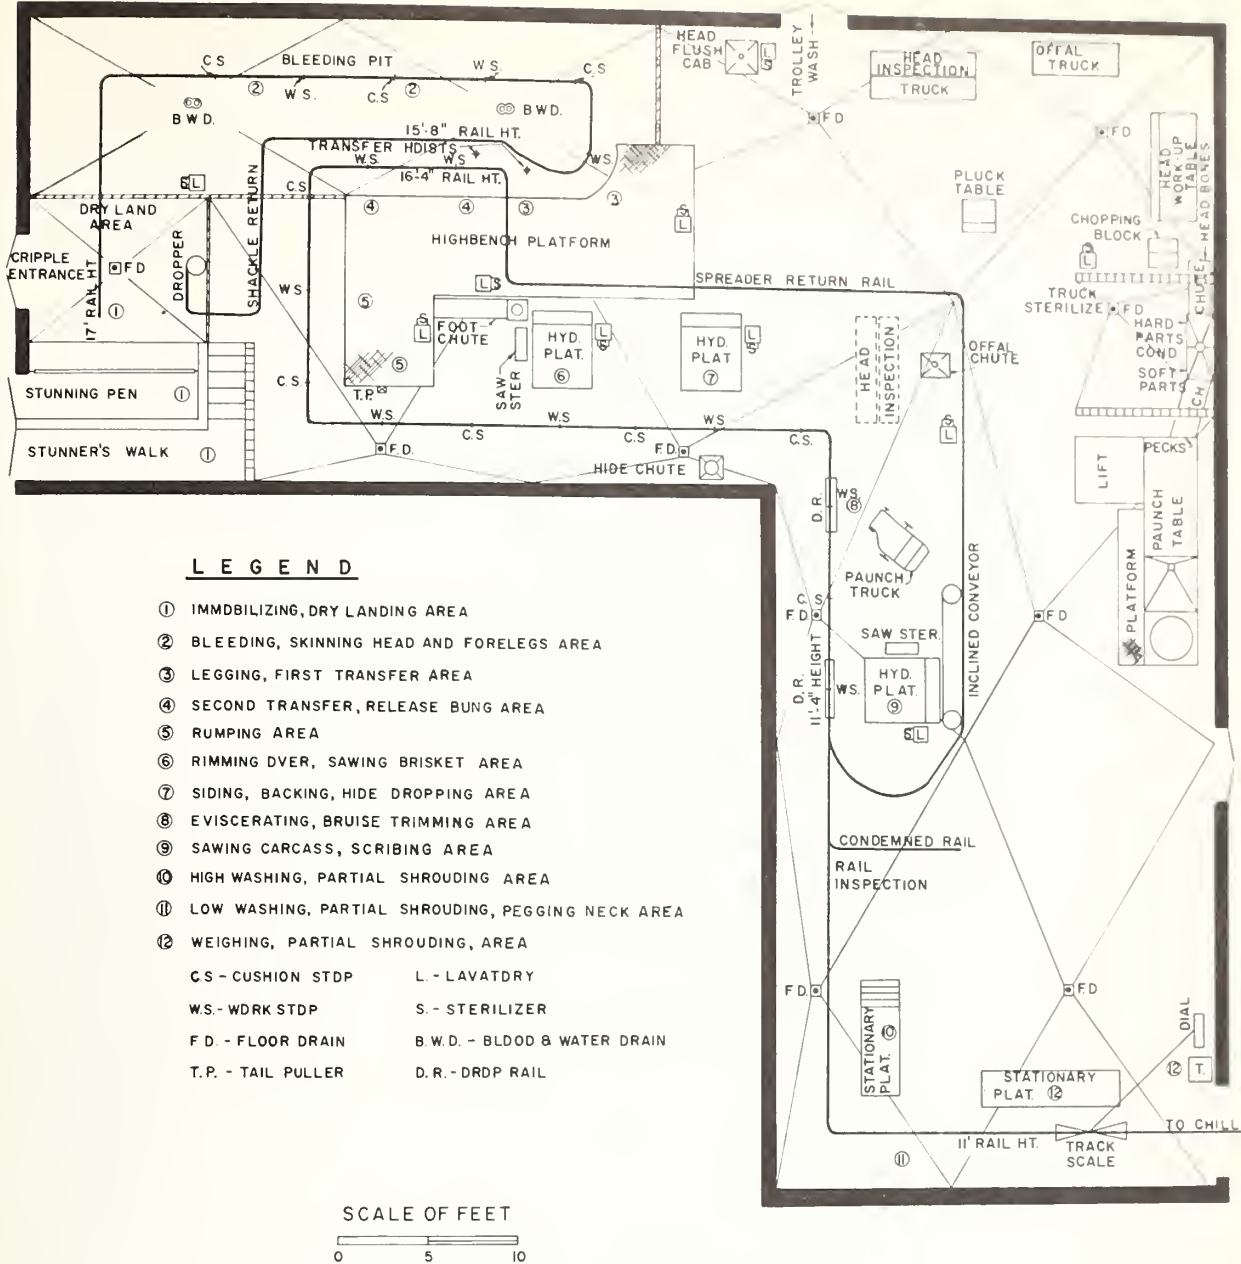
A suggested layout for a gravity on-the-rail killing-floor system designed to slaughter 24 cattle per hour.
